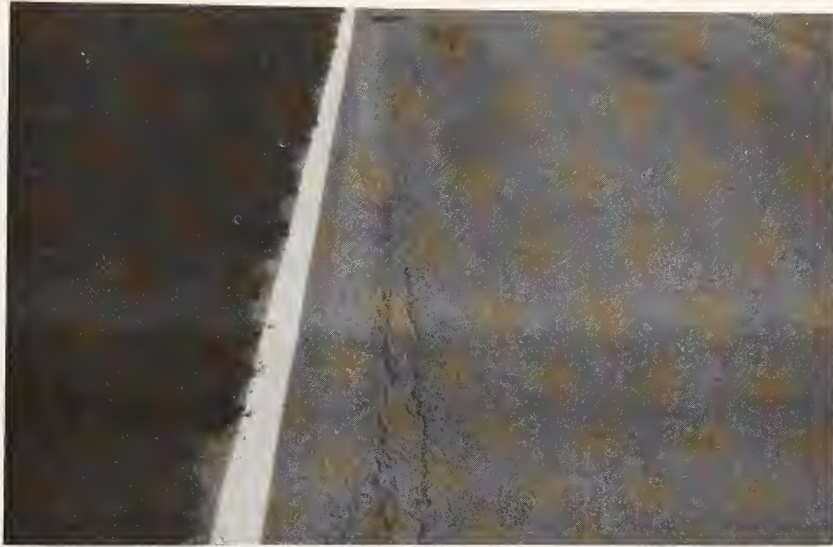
Medium Severity Joint Reflection Cracking from Longitudinal Widening Joint in PCC Slab.
